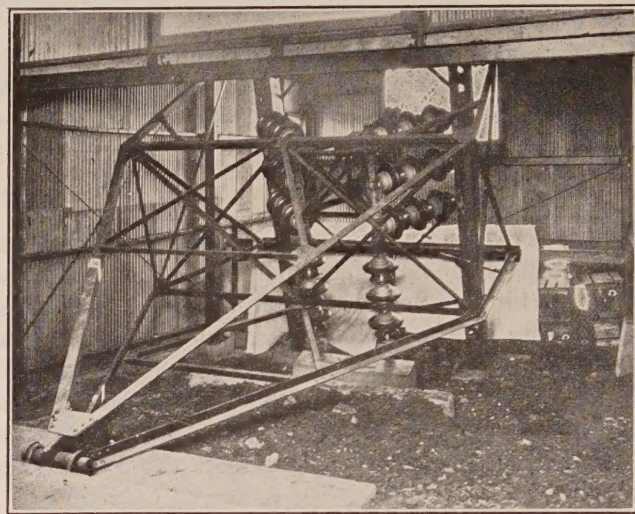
B—VIEW OF GROUND END OF ANCHOR STRUCTURE
